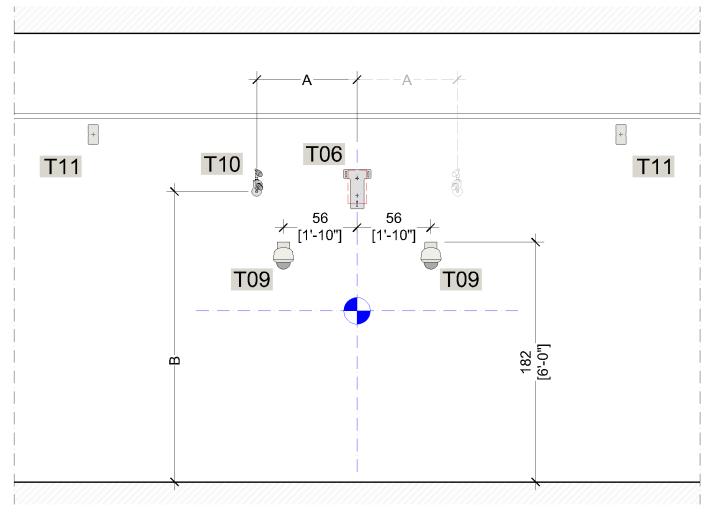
Treatment Room Sagittal Wall (Elevation)
